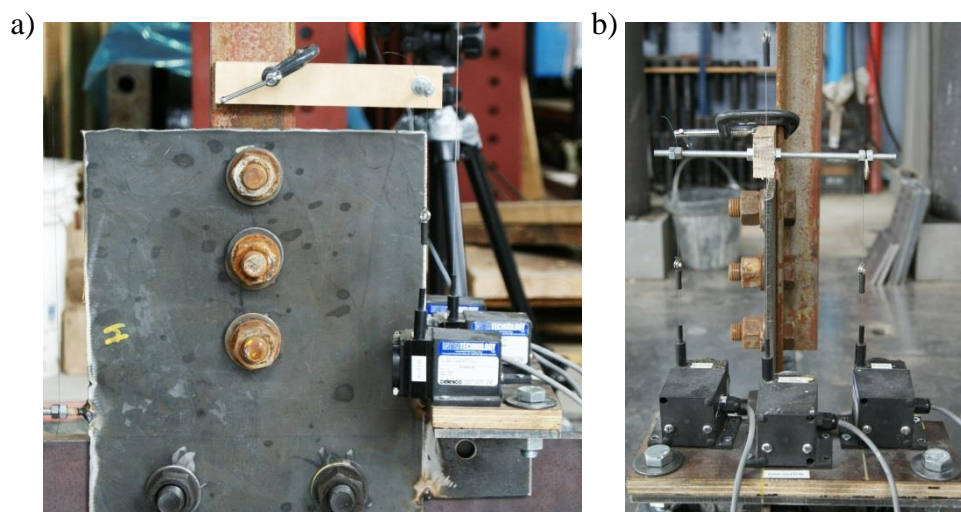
Instrumentation at the bottom gusset plate: a) front view; b) side view
